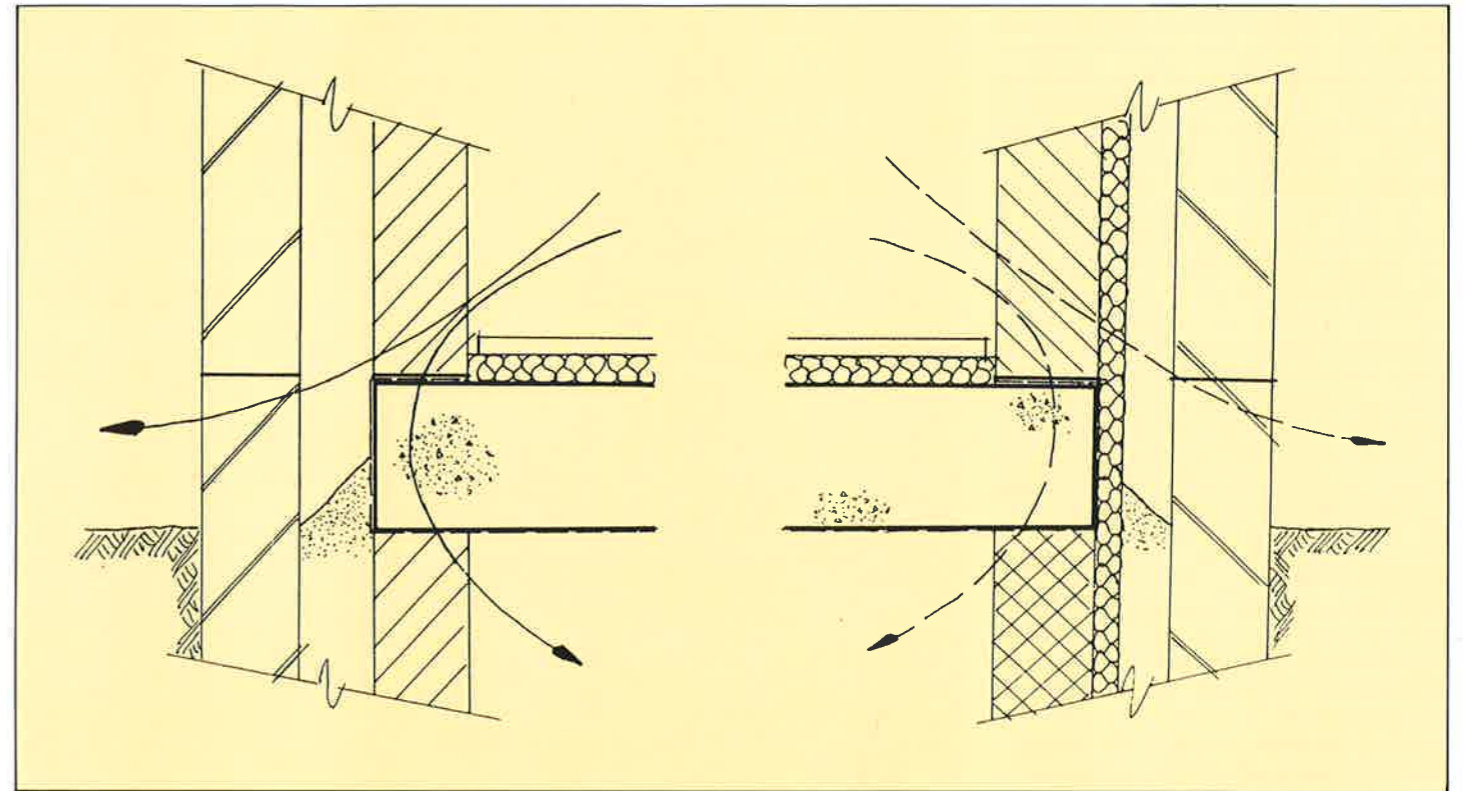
Reduced cold bridging, using low density concrete block & extended cavity wall insulation
